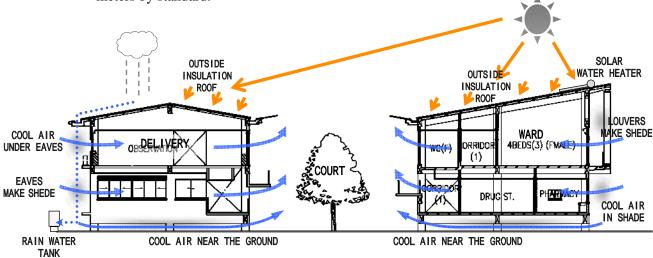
Cross Sectional View of the New Gizo Hospital
